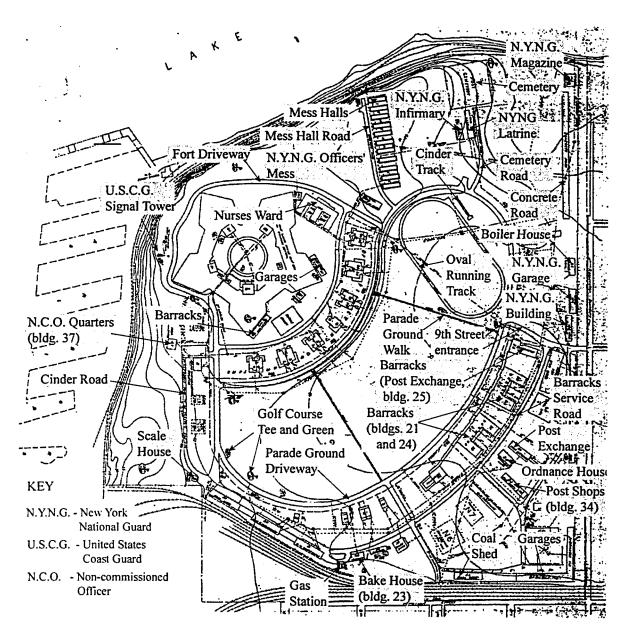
Plan, "Fort Ontario, Oswego, New York, Existing and Proposed Construction," showing addition of new buildings, structures and circulation systems, L. Scott, 1938. Reproduced from copy on file at Fort Ontario State Historic Site. Original located in RG 92, National Archives, Washington, D.C.
